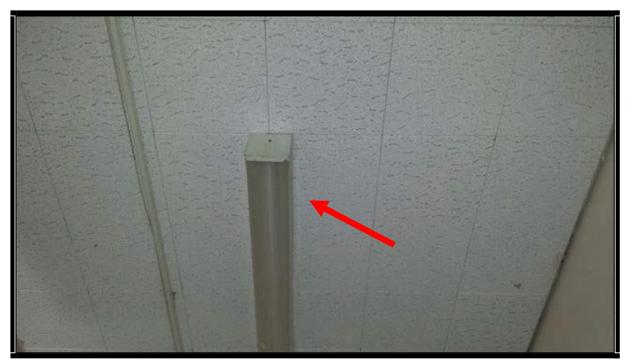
1'x1' Gouged Ceiling Tile, White
